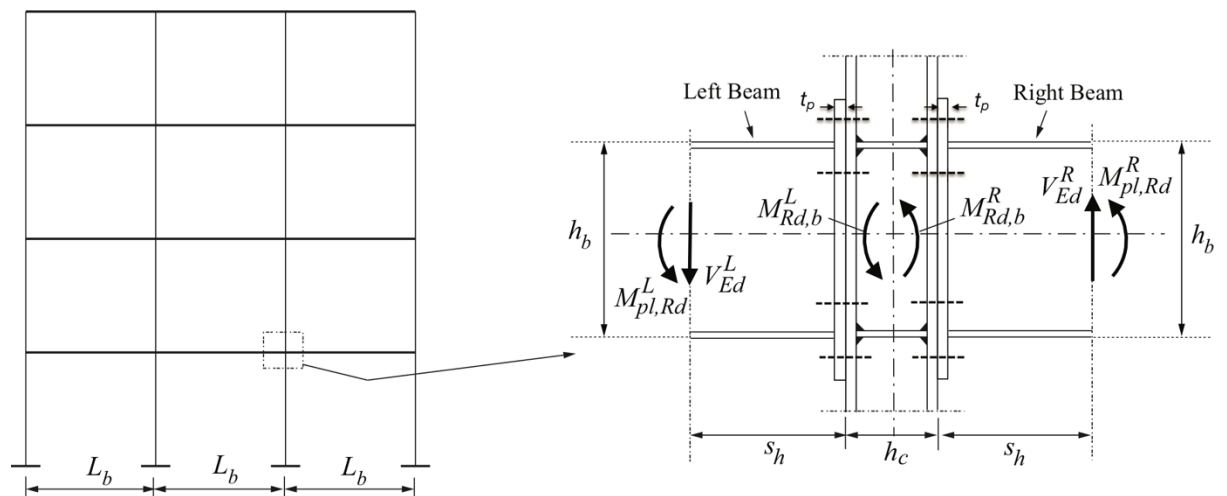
Strong-column/weak-beam ratio check in steel MRFs; illustration for bolted end-plate beam-to-column connections
